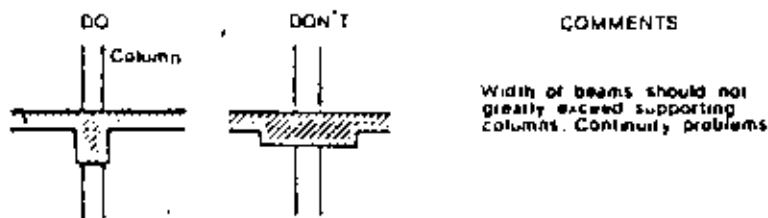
Simple rule for widths of beams and columns in seismic reinforced concrete buildings
